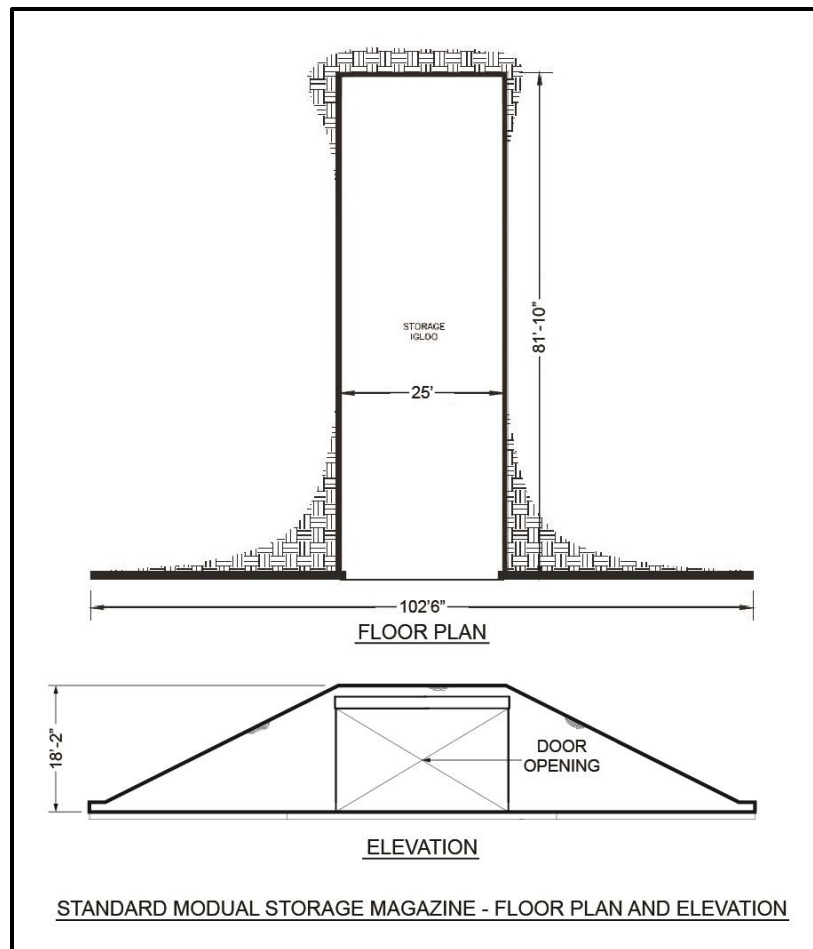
Floor Plan and Elevation of Type “D” Magazines
